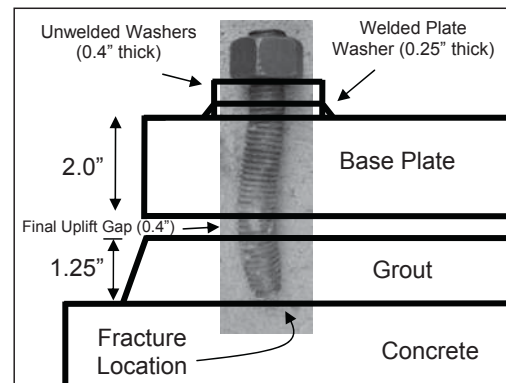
Deformed anchor rod from test 4 superimposed on base plate assembly detail.
